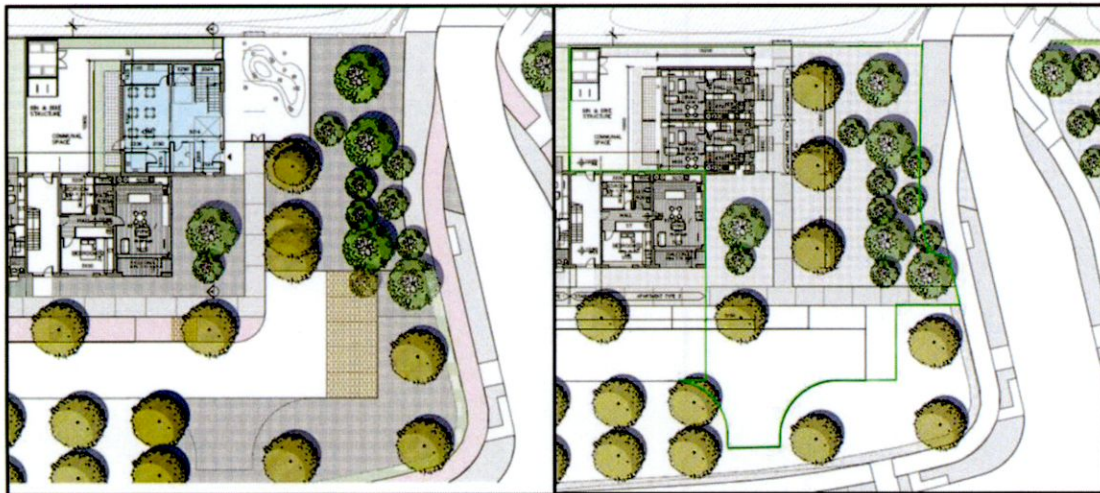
Permitted vs As-built Parking layout [extract from Darmody Architecture drawing]
